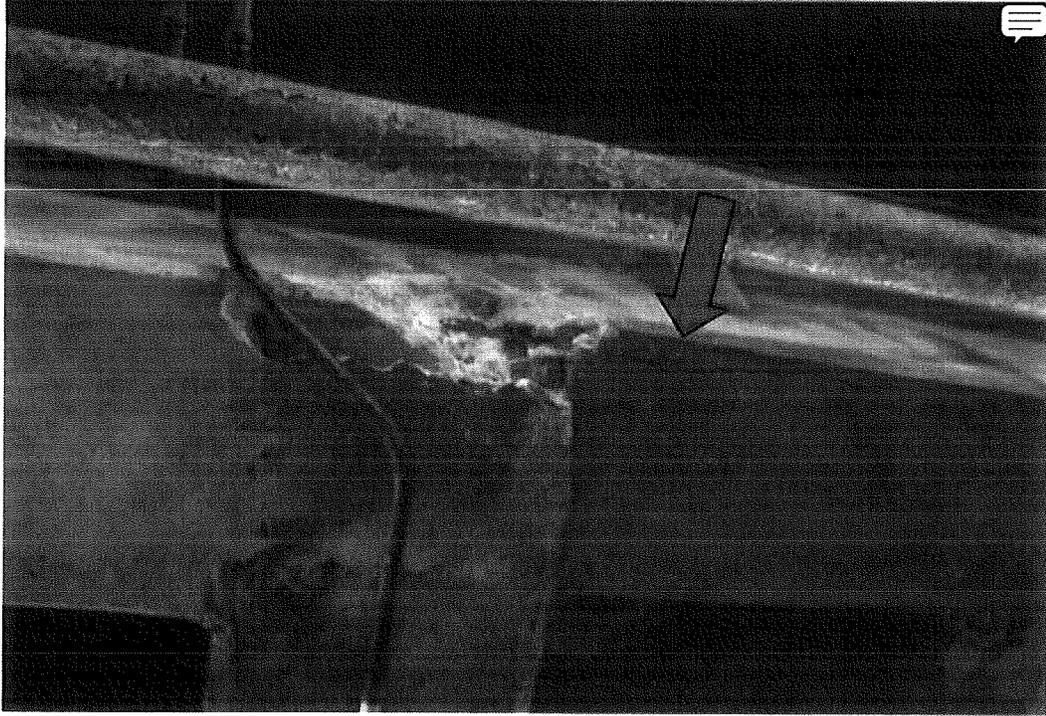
Cracked and hollow sounding concrete encasement. Underside of Parking Level 6, at Column Line 5/ L2. (Approx. 5 SF)
